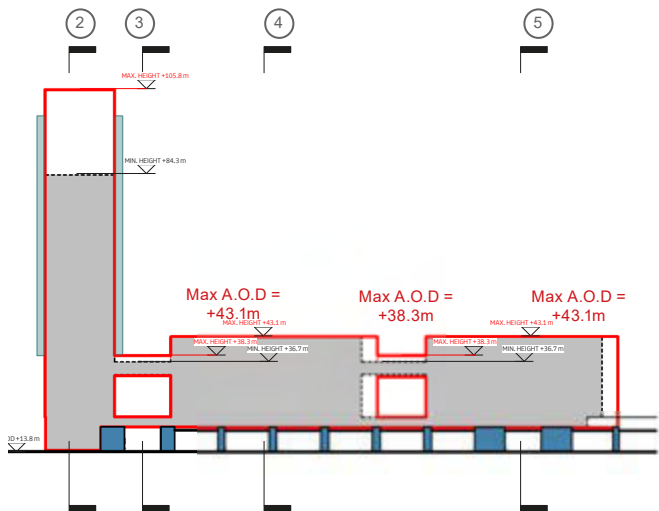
Long section 1 - minimum and maximum parameters
